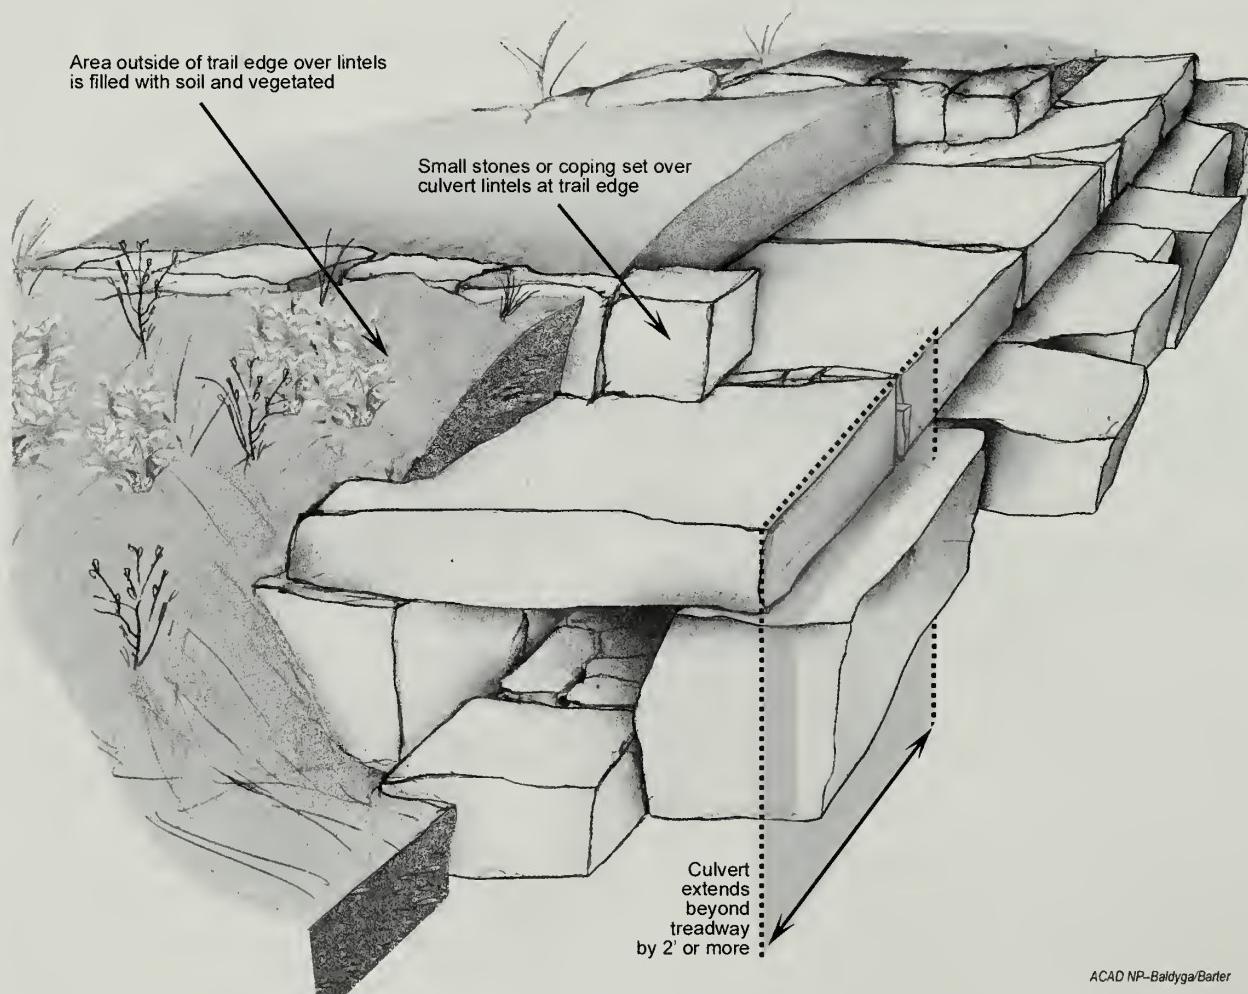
Detail of a graveled-over culvert with vegetation cover, as was used on the Schooner Head Road Path (#362).
